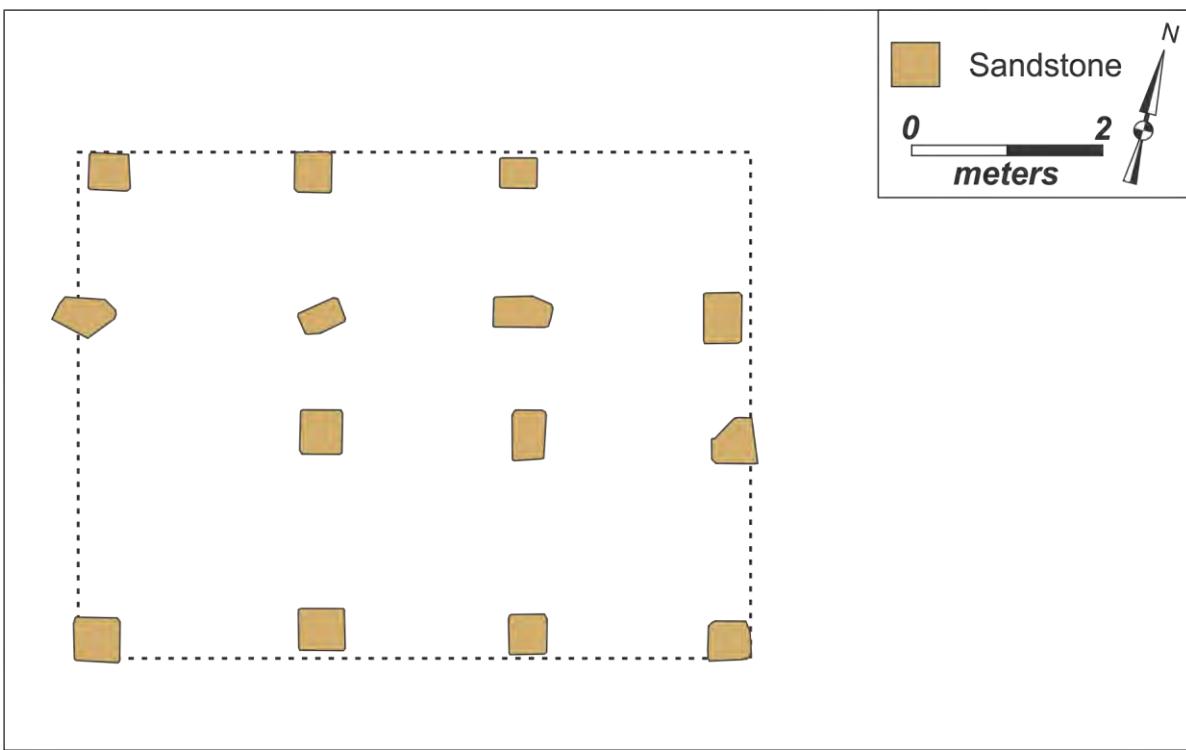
Example of a cut sandstone block support pier outbuilding foundation from Bamboo Farmstead (33Pk211).
